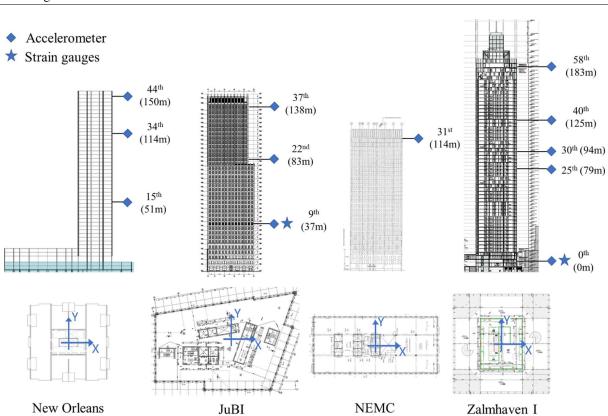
Side views and cross sections of the studied buildings indicating the instrumented floors and the building axis system.
